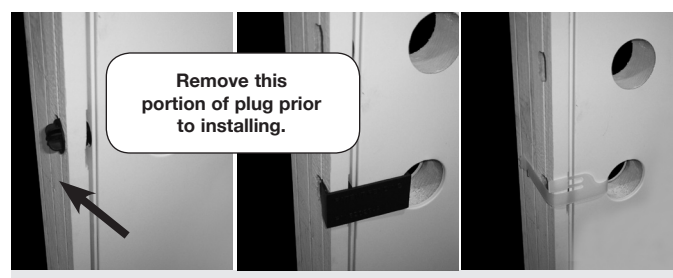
Some door units may be supplied with a "clip" or "plug" holding the panel aligned and closed during the initial installation steps. Do not remove at this time. Some door units may be supplied with a double headed nail or screw holding panel closed - this needs to be removed at this time.
